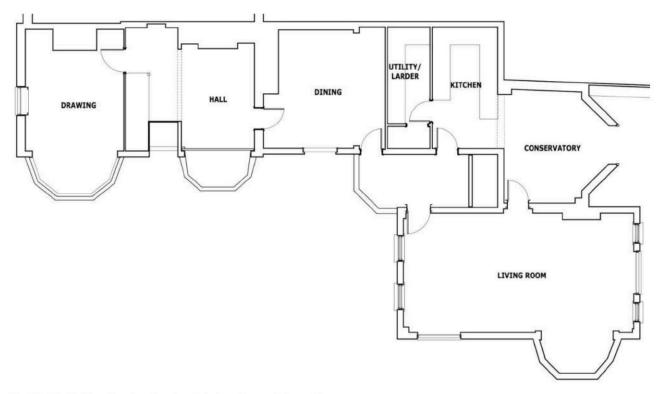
2013 Planning Application Existing Ground FLoor Plan
